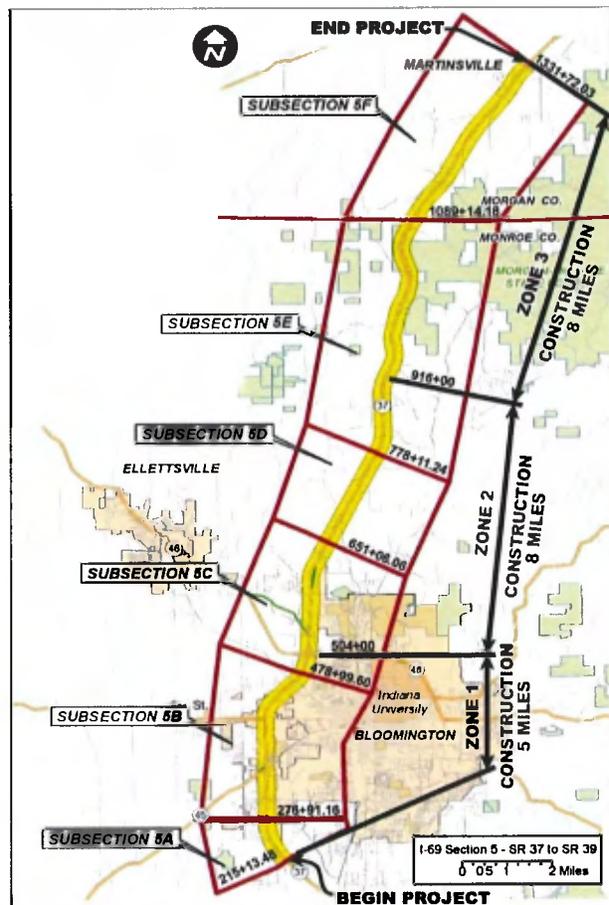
I-69 Section 5 Project Limits and Construction Zones.
